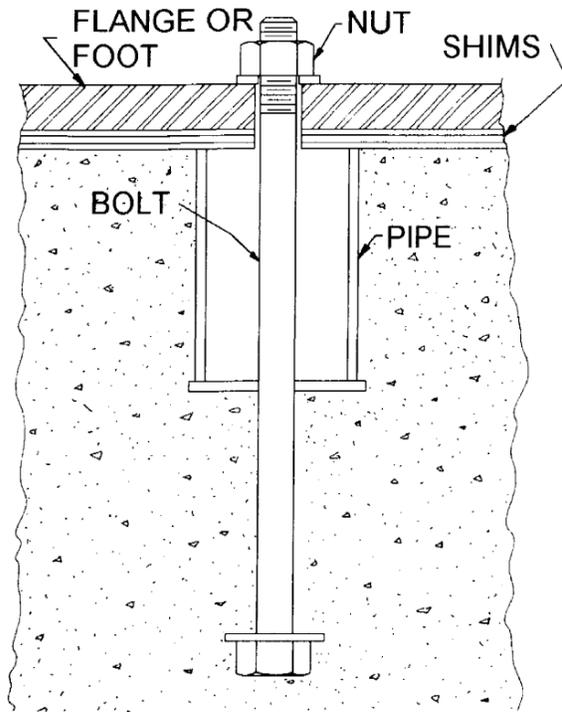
Sleeved anchor bolt
